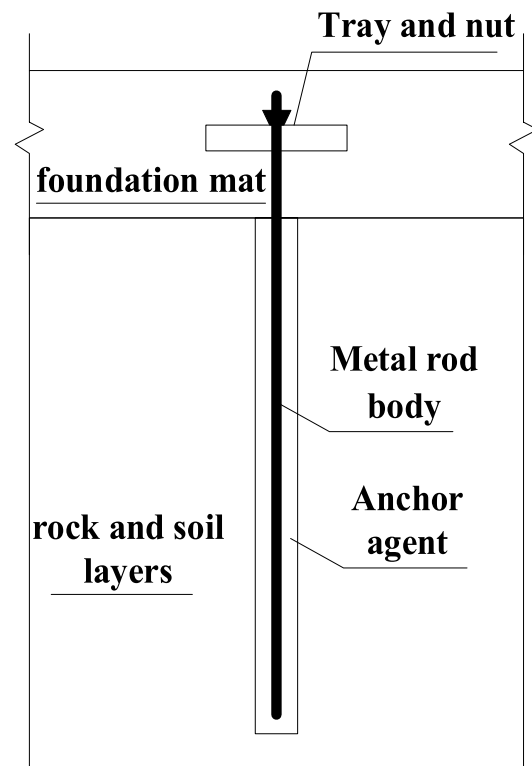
Structure diagram of full-length bonded anti-floating anchor
